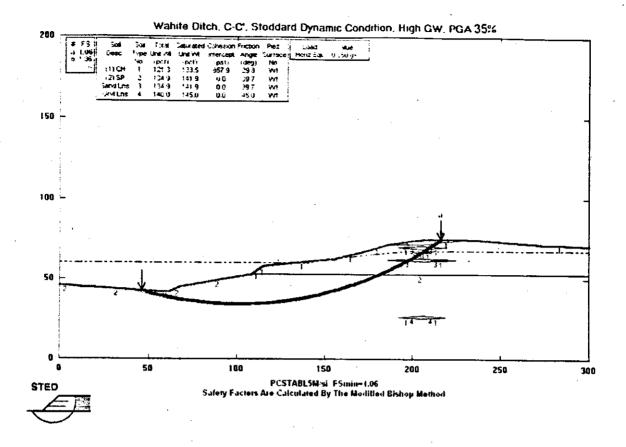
Example Slope Stability Results for the Wahite Ditch Site
